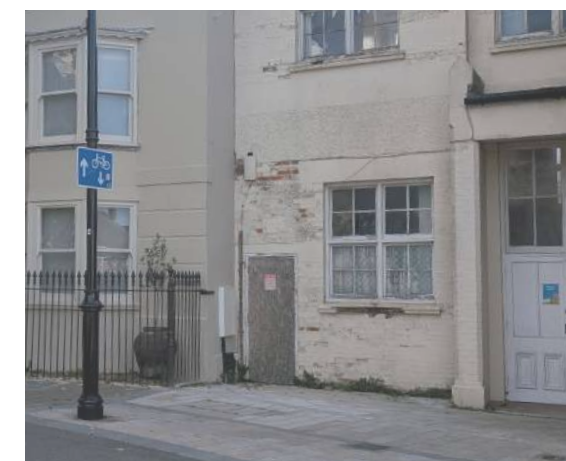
House 5 - Photograph of existing paving & railings adjacent
